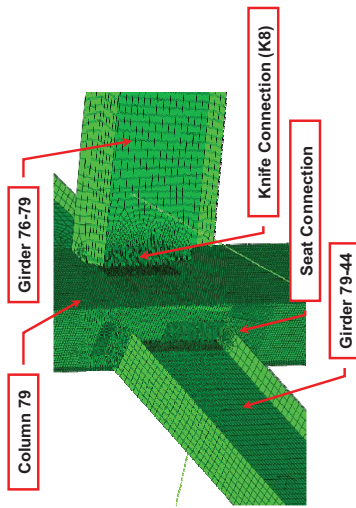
ABAQUS rendering of arrangement of detailed girders and connections at column 79 showing seated connection and the K8 knife connection.
